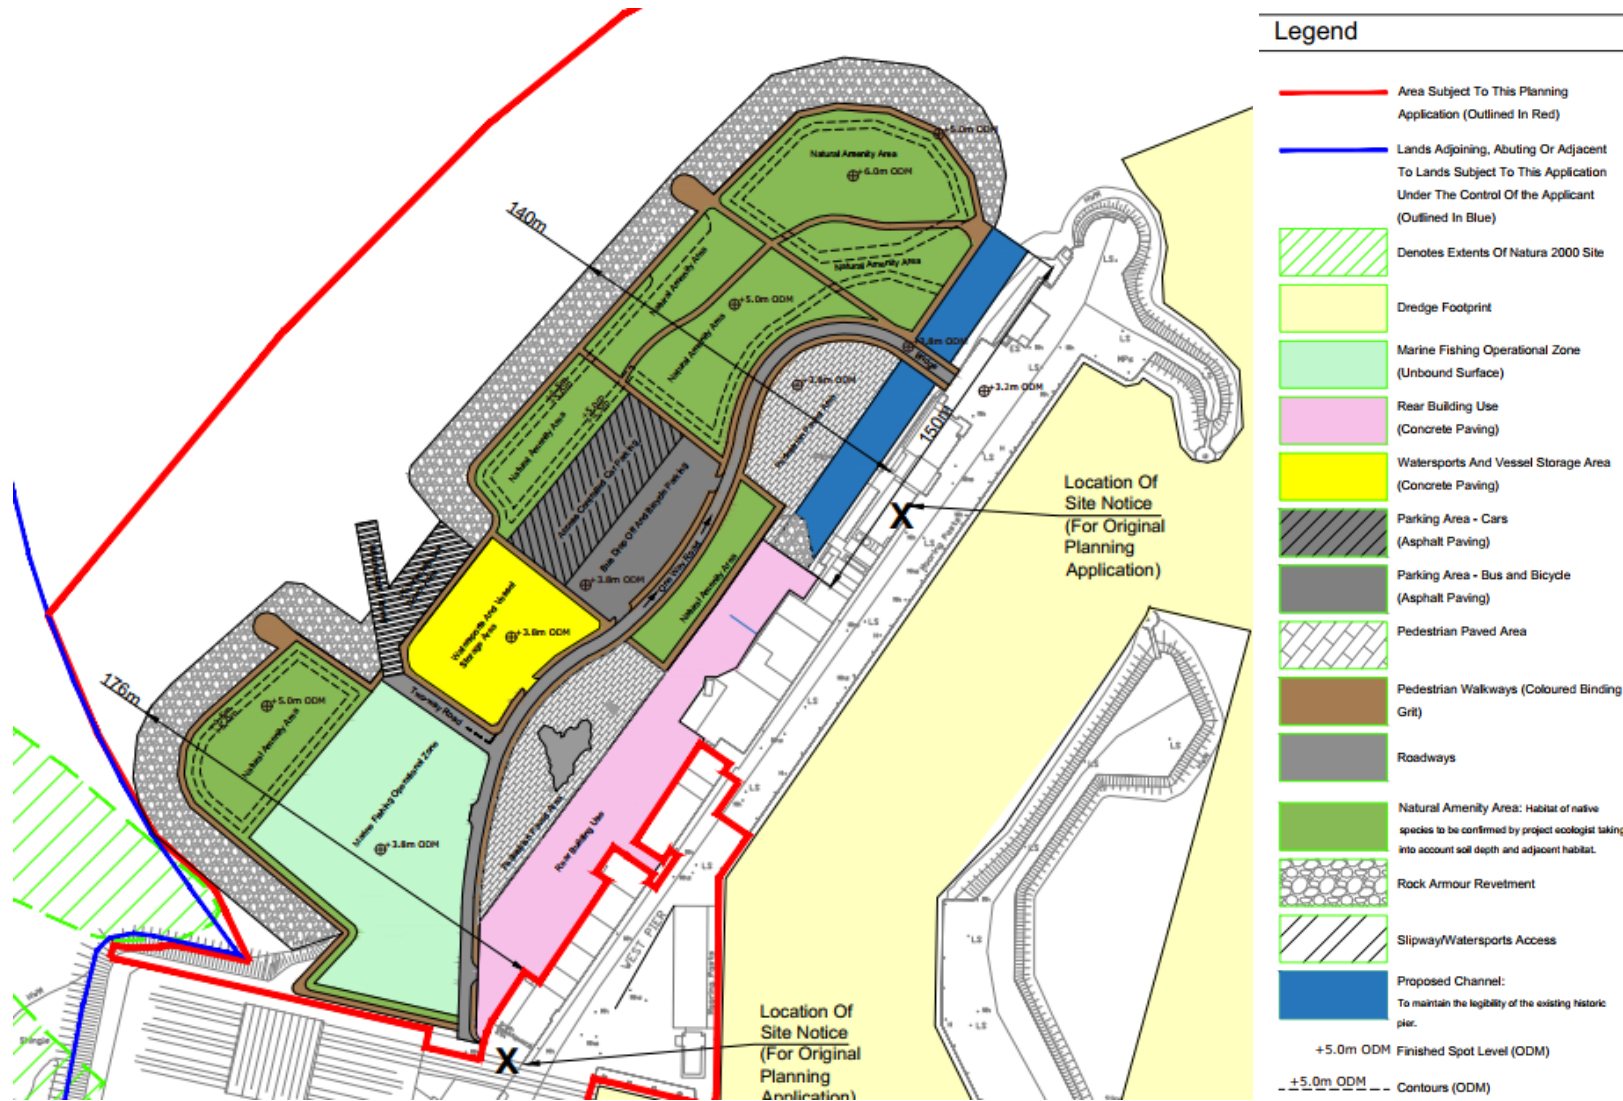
Revised site layout of proposed development (excerpt from planning drawing no. 19934-5002-D-Site Layout Plan).
